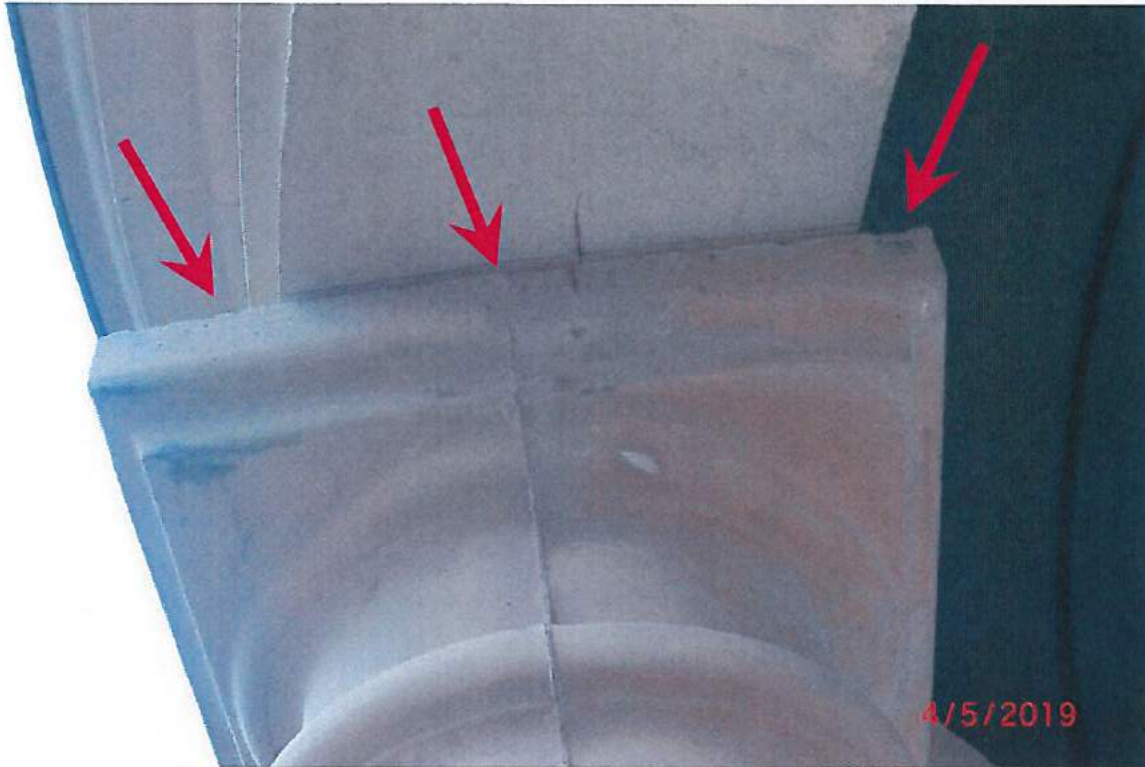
Cracks in ring beam at debonded concrete sections.
